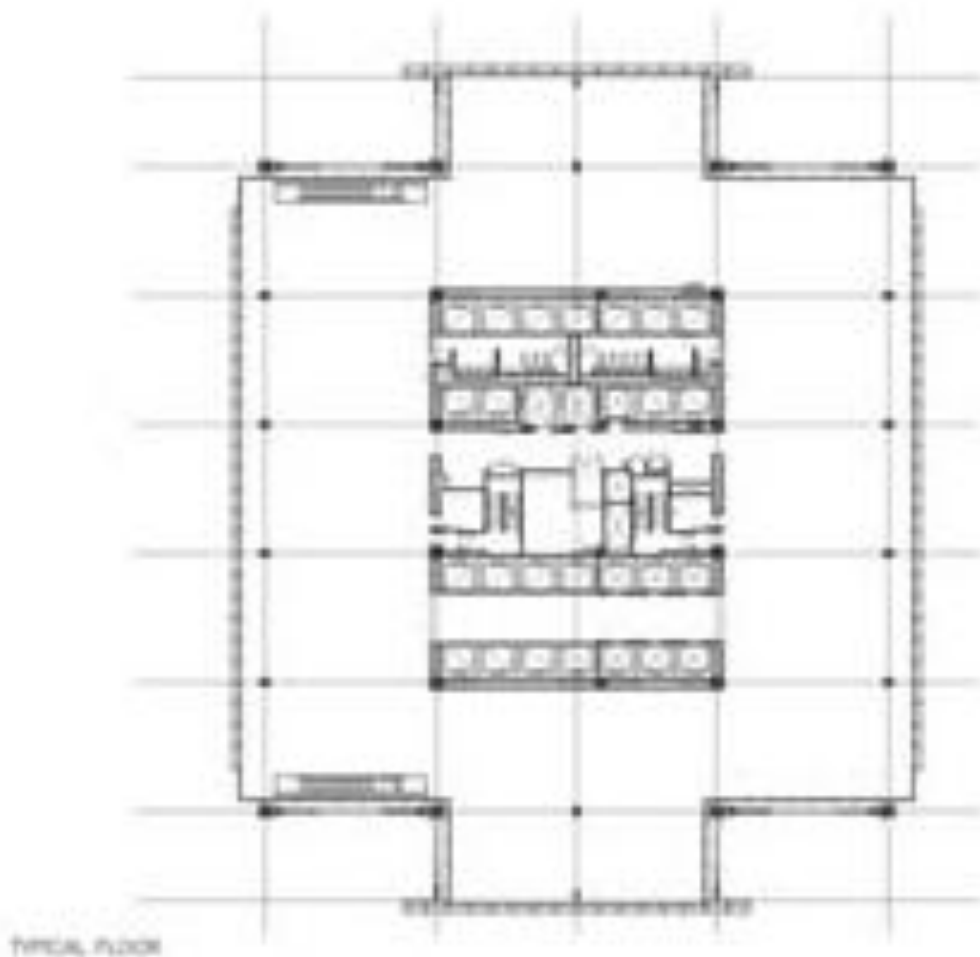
Typical floor of NYT Building. Source: “Renzo Piano Building Workshop”
